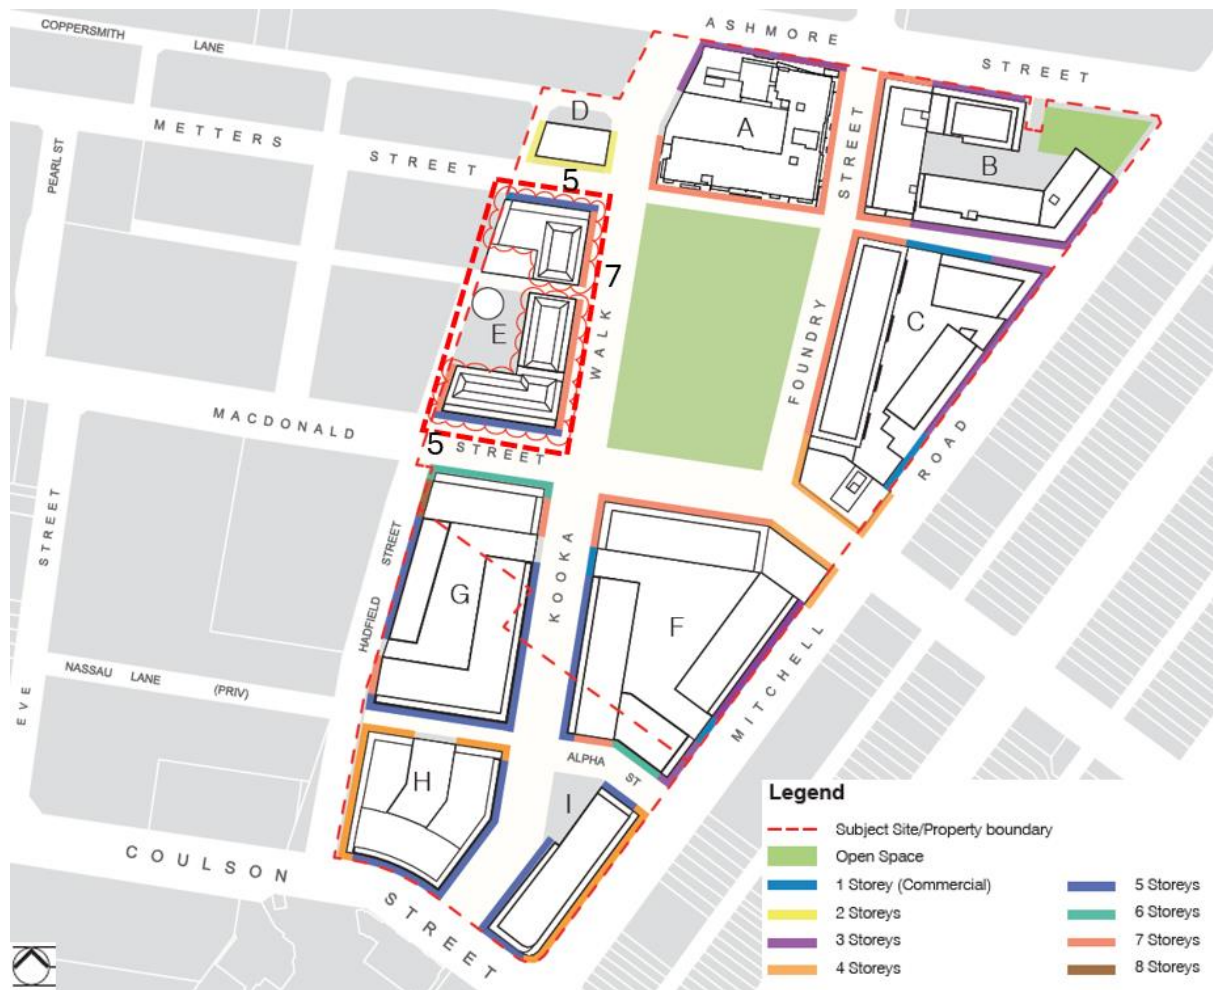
Proposed street wall heights (Block E - outlined by red dashed lines and clouded)
